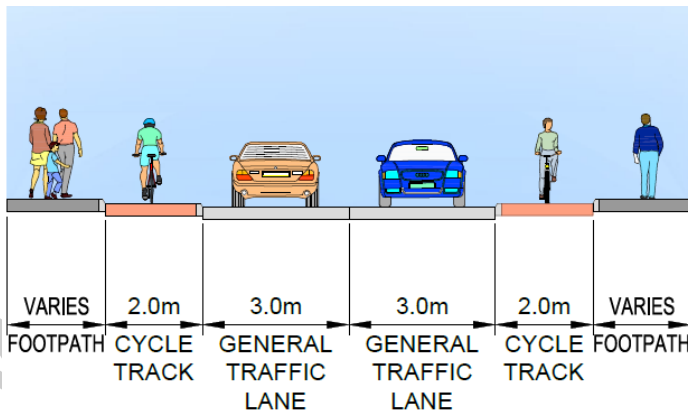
Section 2C, Proposed Option 1a/1b – Cross Section A-A
